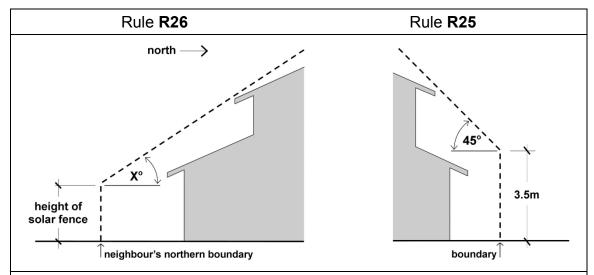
Typical building envelope for rule R25 and solar building envelope for rule R26
